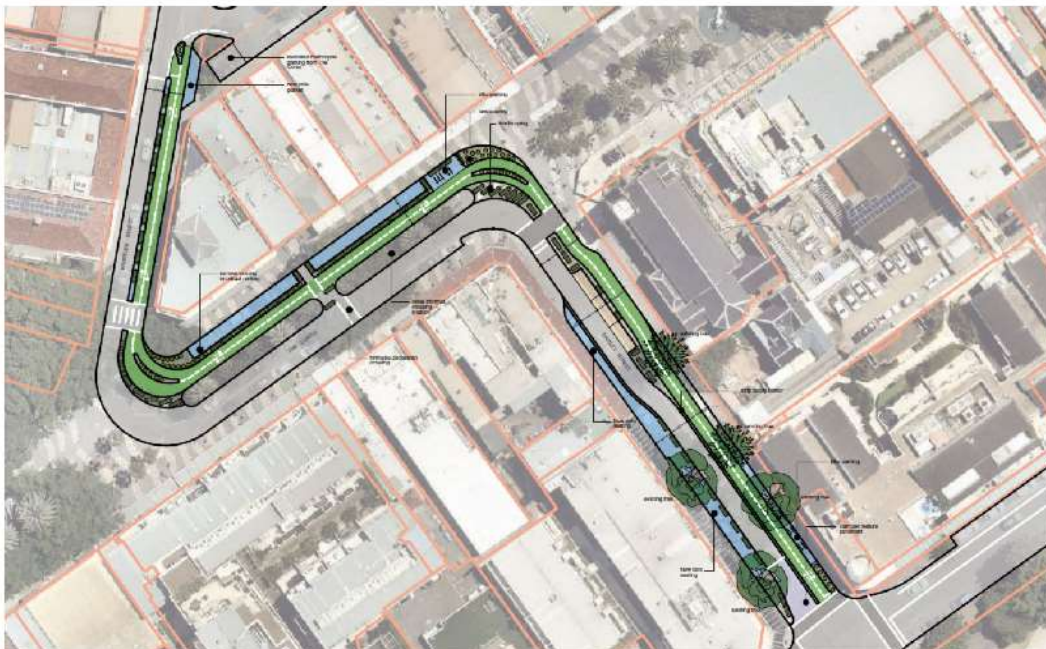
Darley Road, Whistler Street and The Corso proposed configuration
